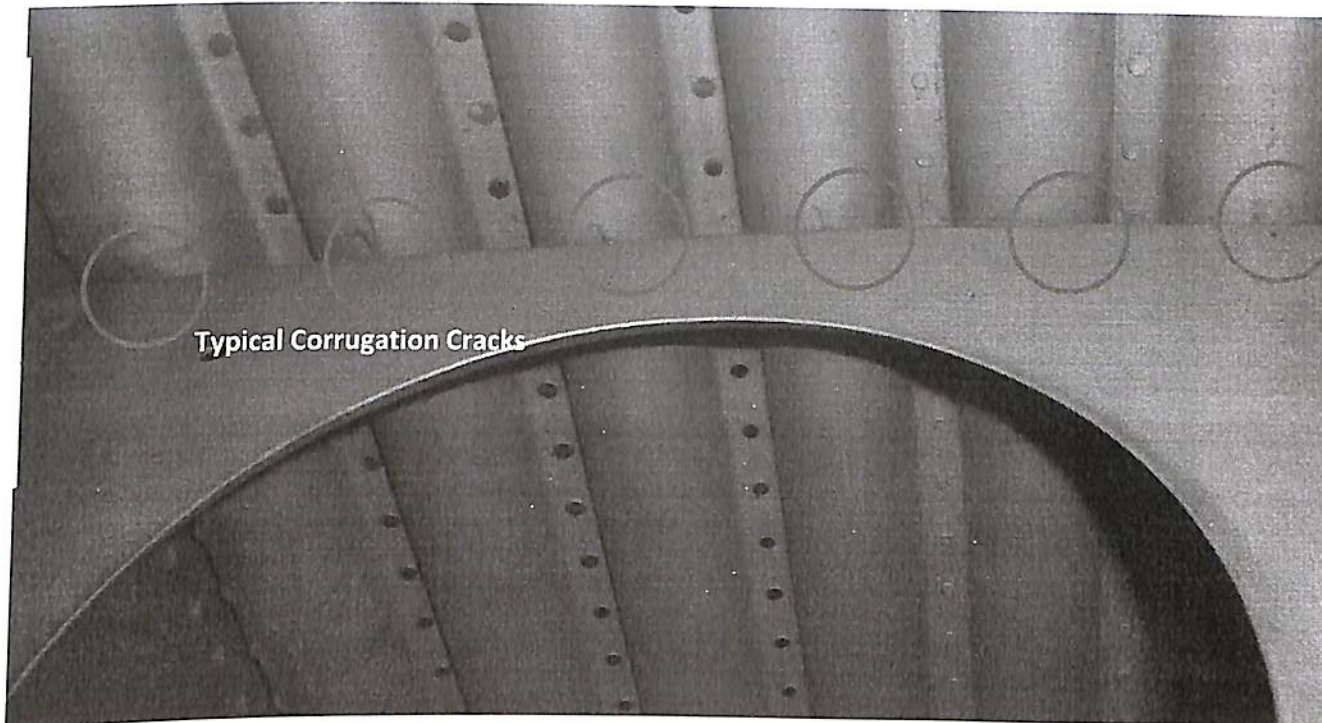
A – TYPICAL CORRUGATION CRACKS
